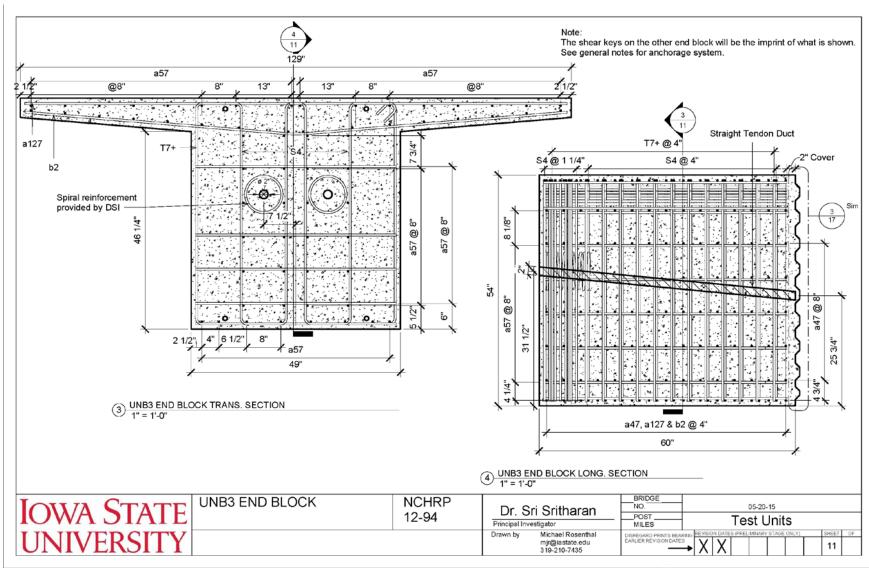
UNB3 End Block Longitudinal and Transverse Section
